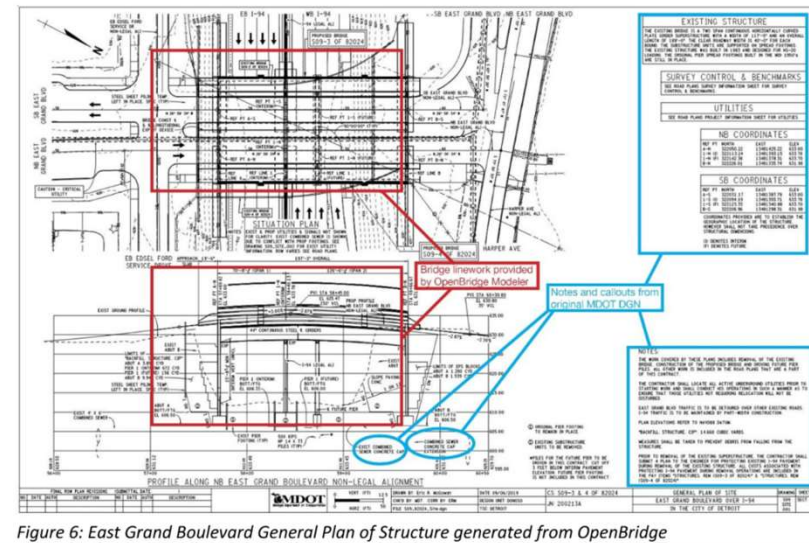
East Grand Boulevard General Plan of Structure generated from OpenBridge
